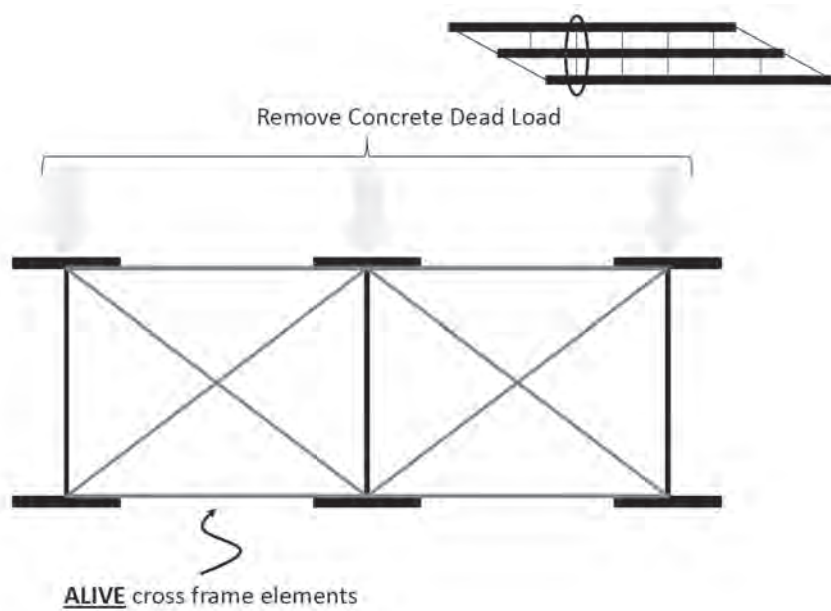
Removal of concrete dead load from girders after making cross-frame elements alive.
